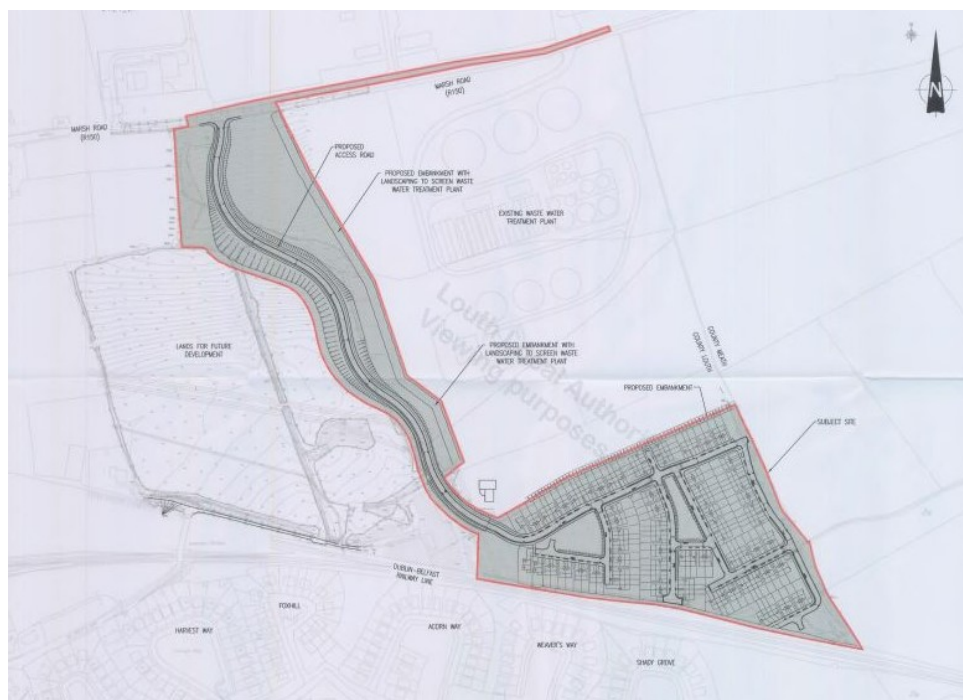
Extract from site layout plan of Reg. Ref.: 17387
